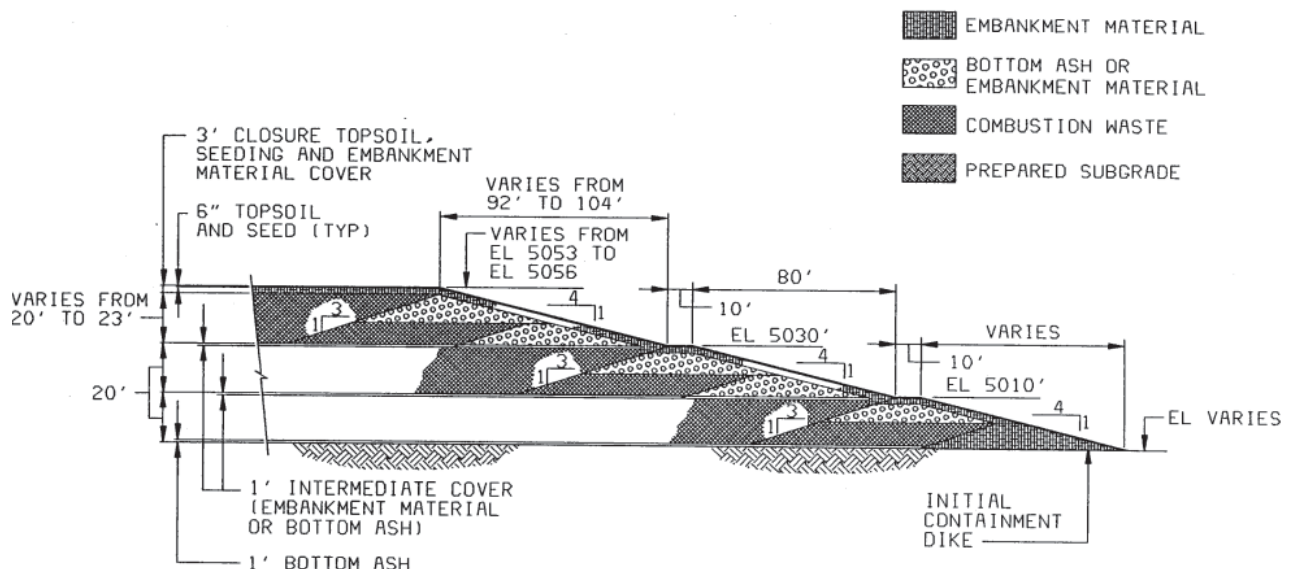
Cross Section of Final Landfill Configuration [2]
